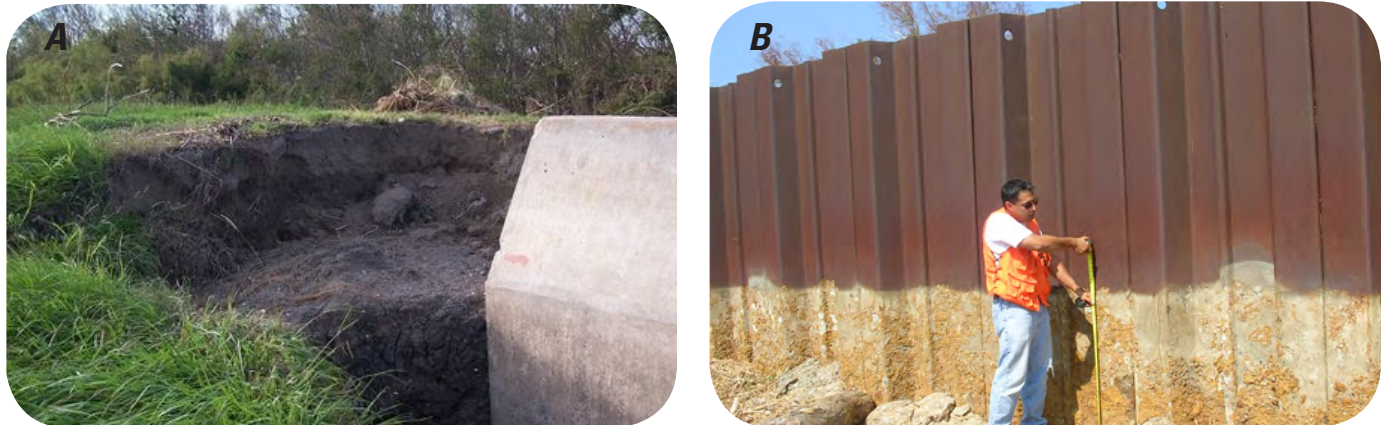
Wall edge showing scour into the adjacent earth wall (A), and soil at protected side removed by overtopping (B).
